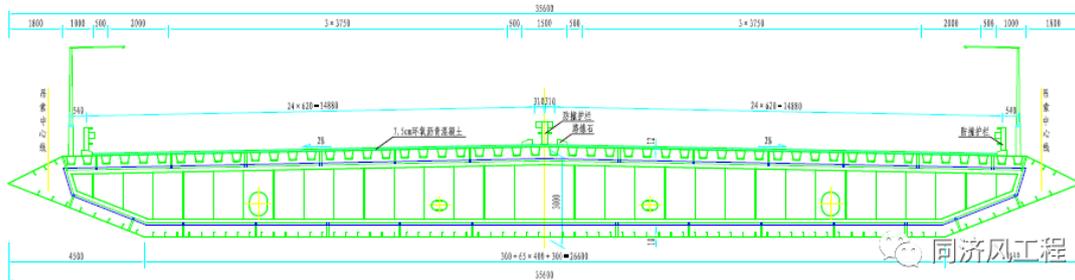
Standard cross-sectional view of stiffening girder of Humen Bridge (Unit: mm)
